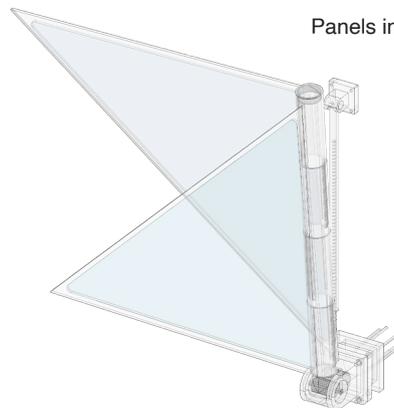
a) Swinging beam I retractable wind bracing element - section - deployed state
